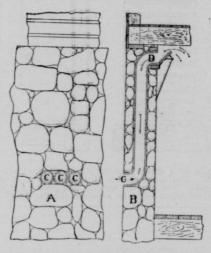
Method of installing a fresh air intake in a stone wall during construction. Front elevation A shows openings CCC. Cross section B shows the air intake CD. This intake is constructed of vitrified sewer pipe.
